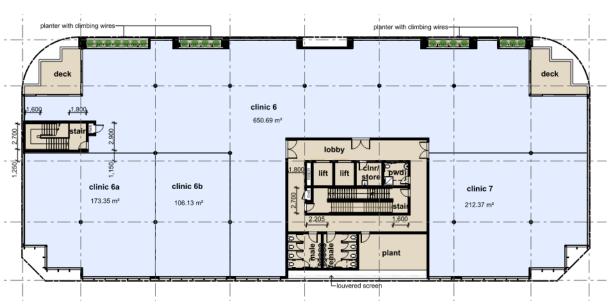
Second Floor Level Floor Plan. Source: Sparc - Issue N dated 05/03/24
